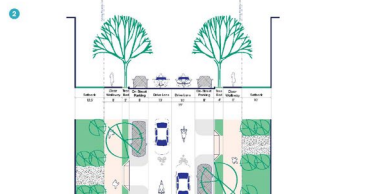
Typical Olive Avenue section between Ash Street and El Camino Real
